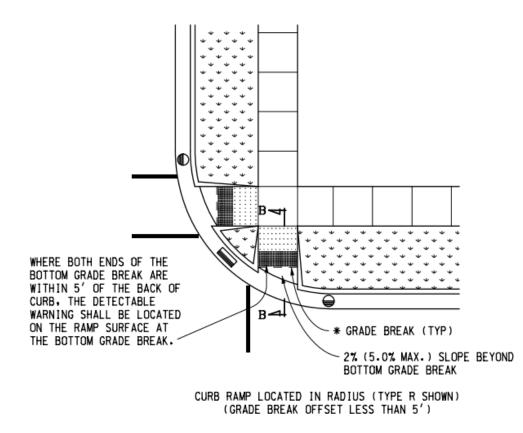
MDOT Curb Ramp Opening Requirement Continued
